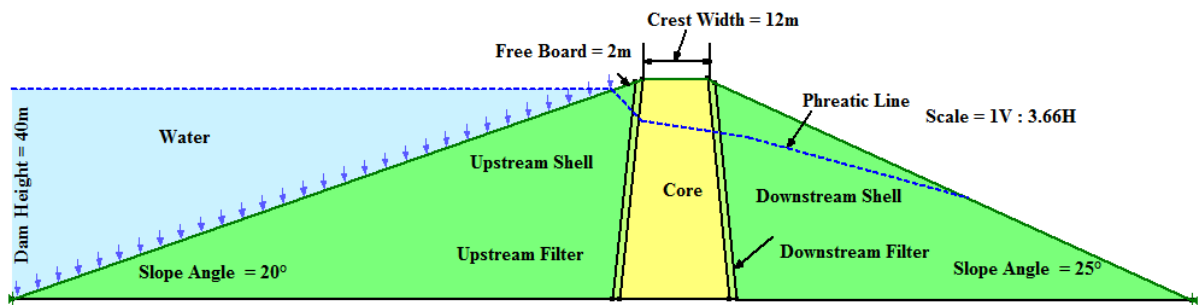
Initial Design of Proposed Berga Embankment Dam
